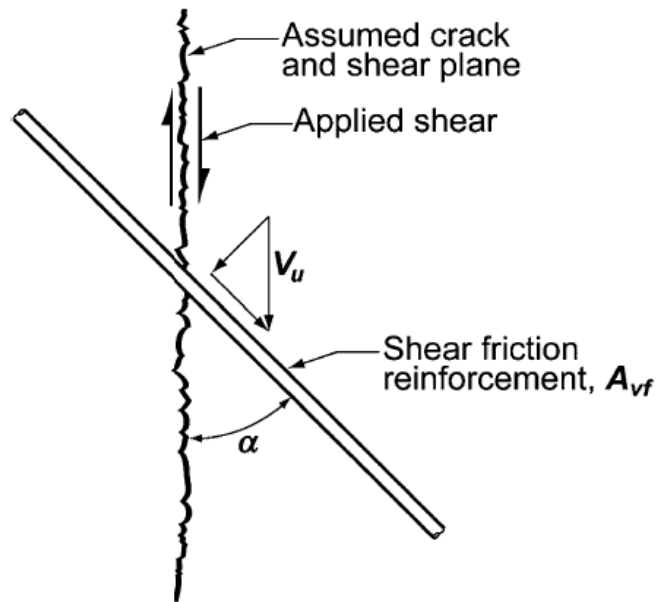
Angle between Shear Friction Reinforcement and Crack Plane
